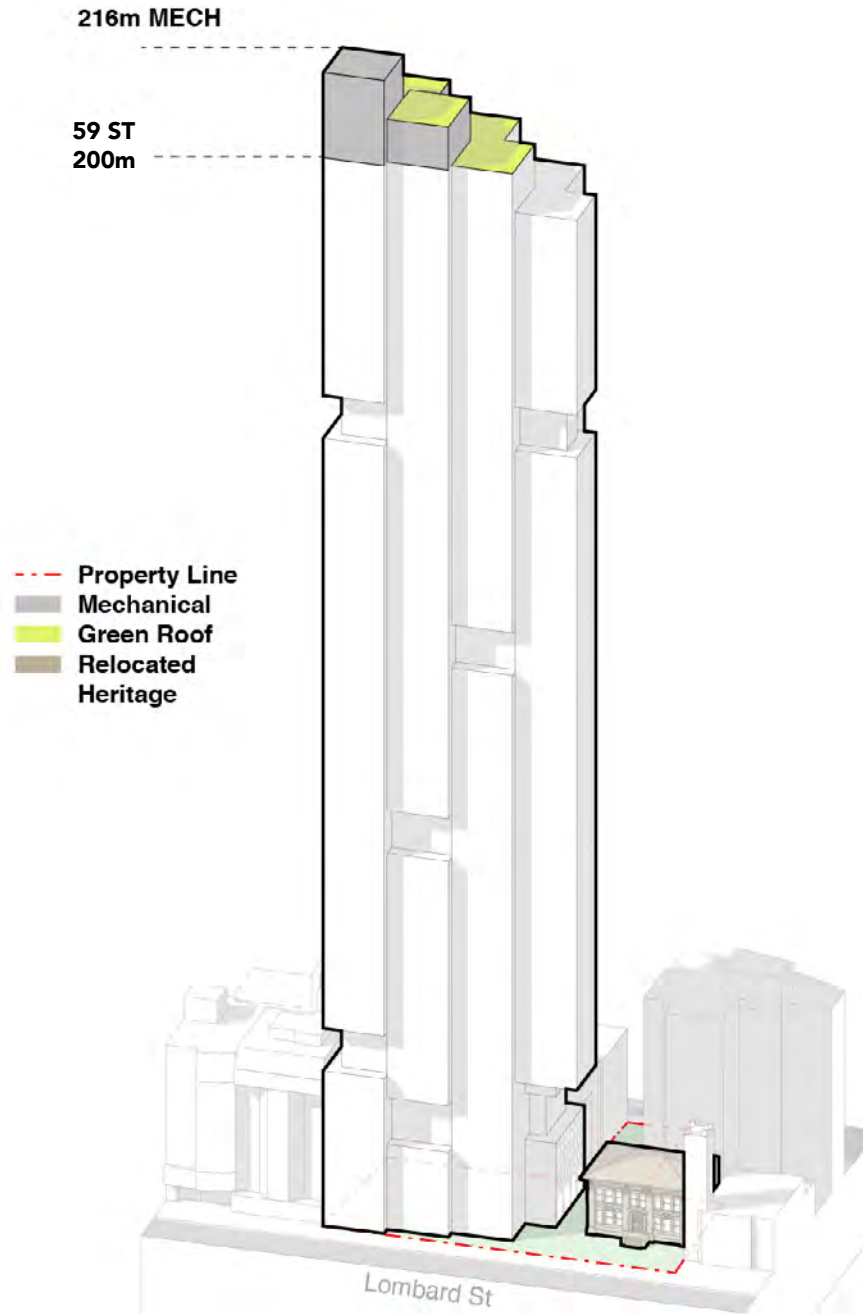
Axonometric building diagram looking north west illustrating the tower top
